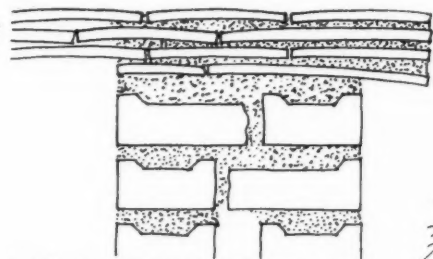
AN OVERSAILING TILE VERGE SHOULD BE BEDDED IN RICH CEMENT MORTAR.
